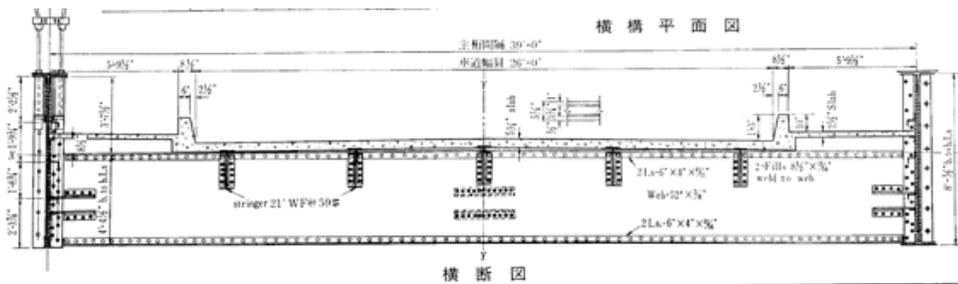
Cross section of the Old Tacoma Narrows bridge
